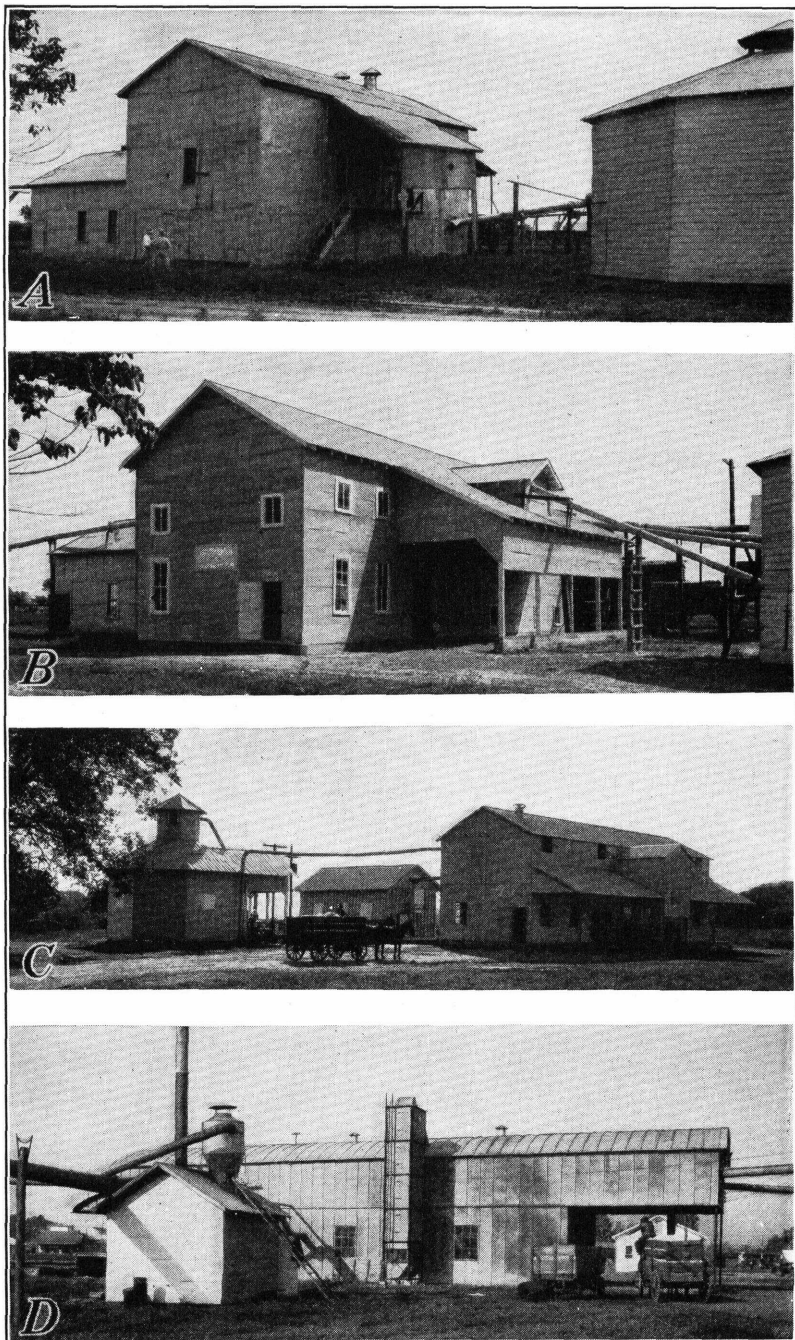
Cotton-gin buildings: *A*, Old-type steel building; *B*, steel with wooden framing; *C*, all steel, inside and outside; *D*, all-steel inside and outside, with bow roof.
